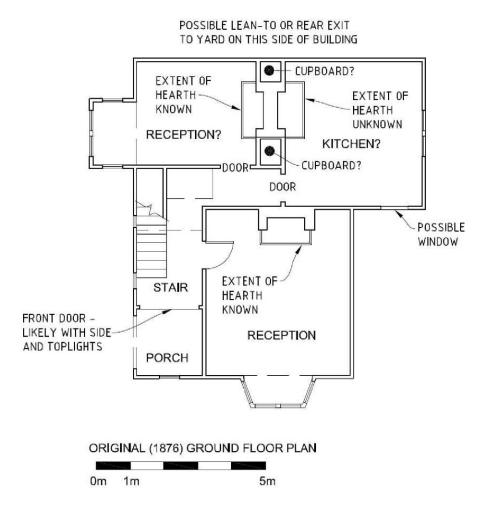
Vicarage building -probable ground floor plan as at 1876 (image courtesy Chessa Stevens)
